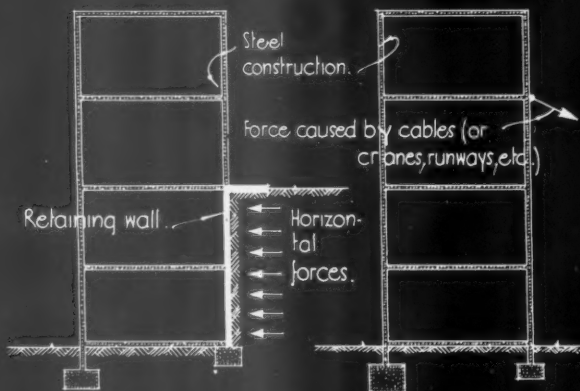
BUILDINGS AGAINST UNBALANCED RETAINING WALLS.
